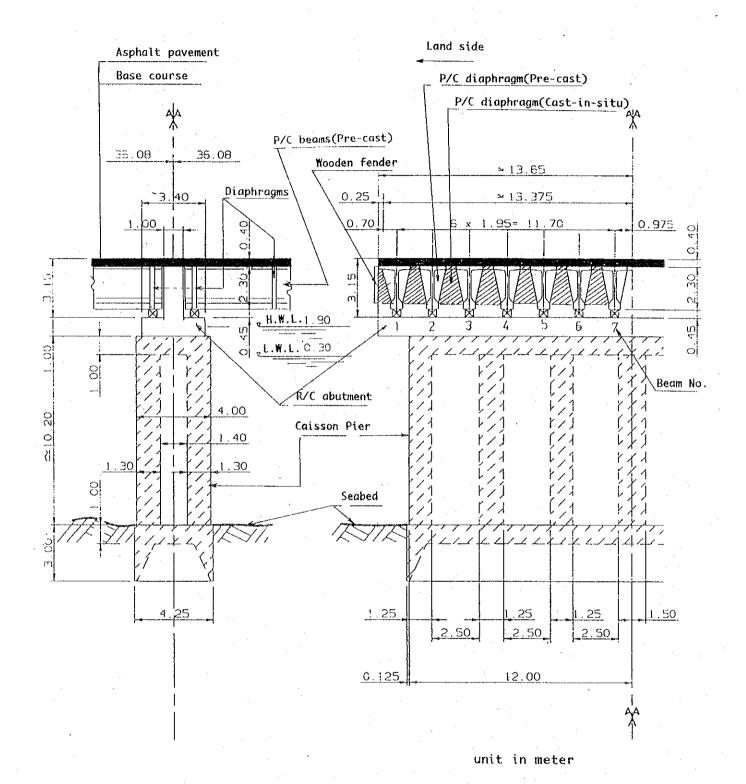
(1)-3 Structural layout plan of Access Jetty Source: Site survey by the Study Team and "Report on Concrete Repairs to Sihanoukville Jetty", SMEC
